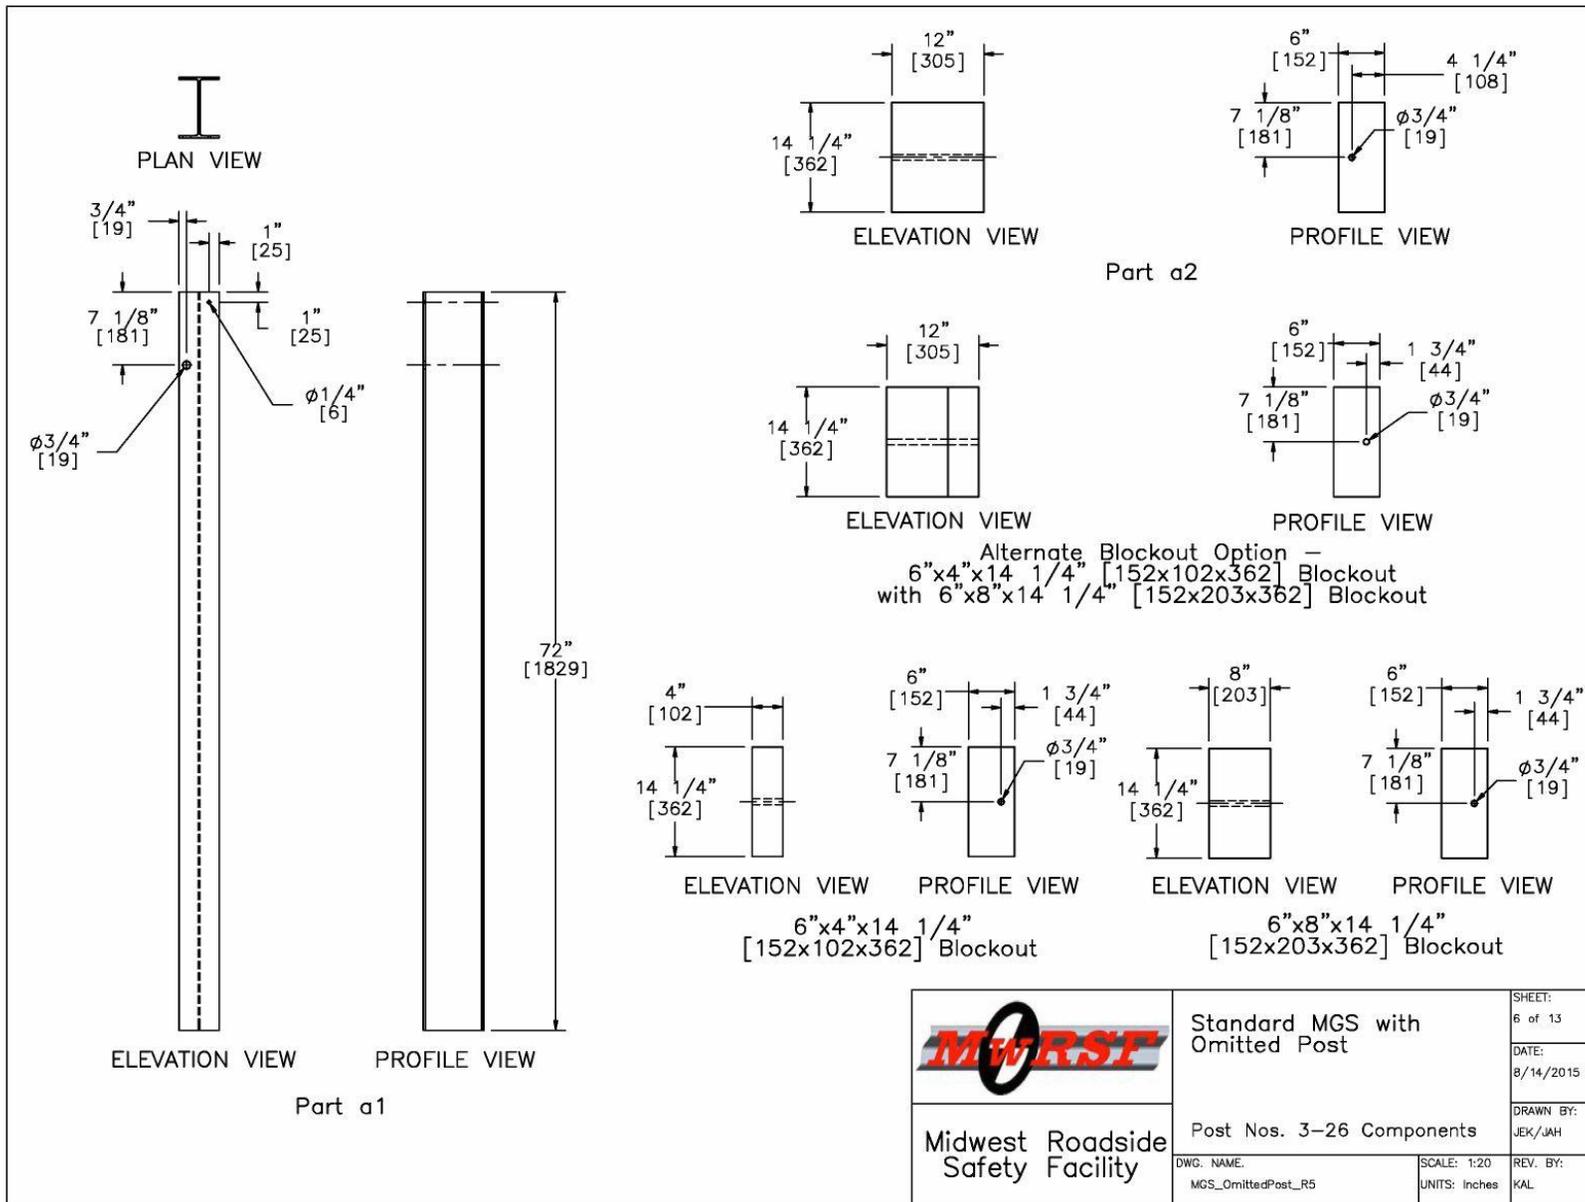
Post Nos. 3 through 26 and Blockout Details, Test No. MGSMP-1
